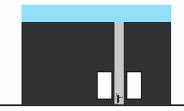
Typical Section, Katra Dullo, Amritsar
